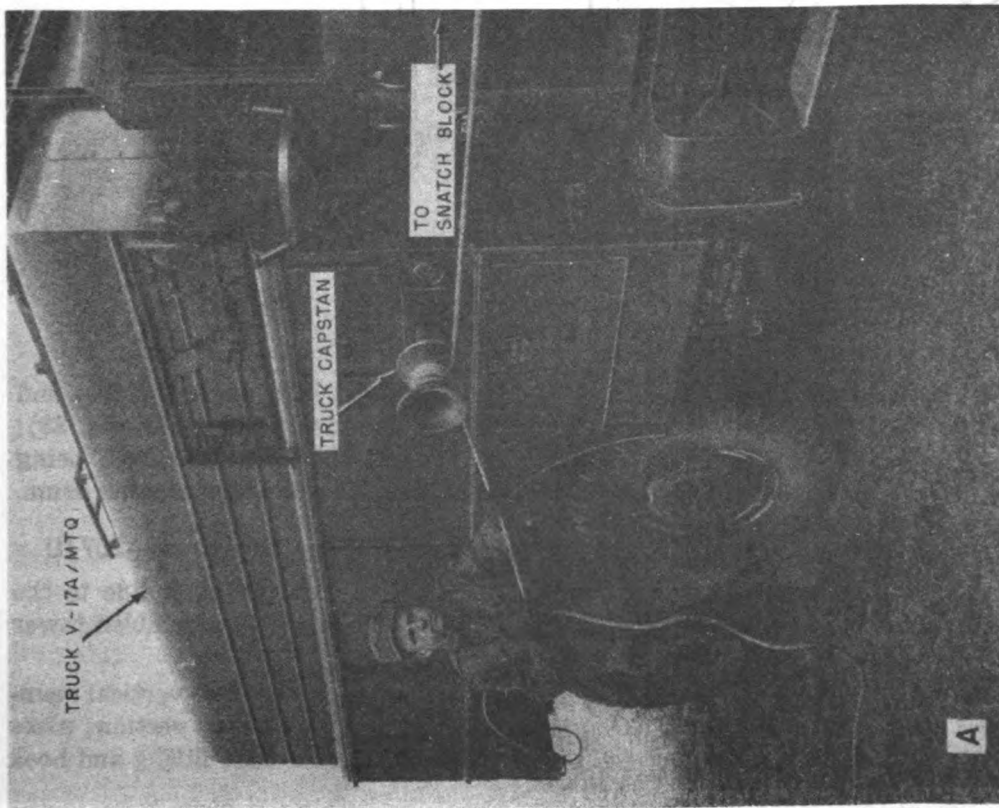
Raising tower sections with Truck V-17A/MTQ.
